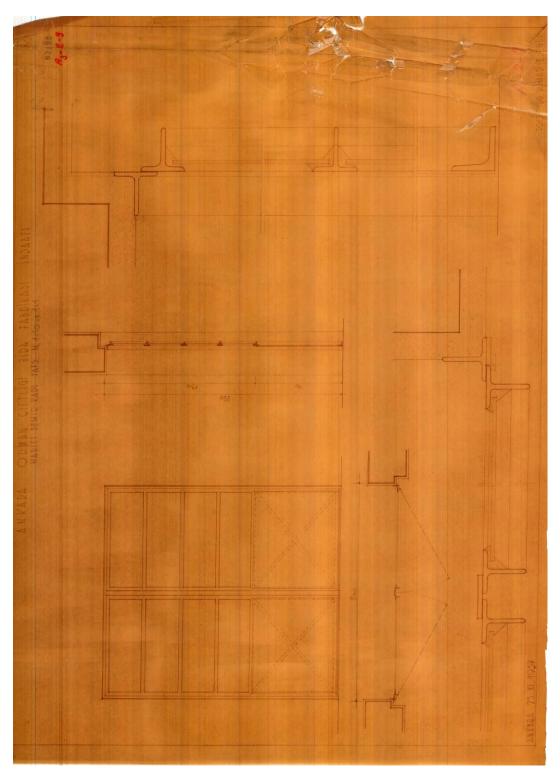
The original drawings of the brewery, iron door detail (Source T.T.A. Archive)
